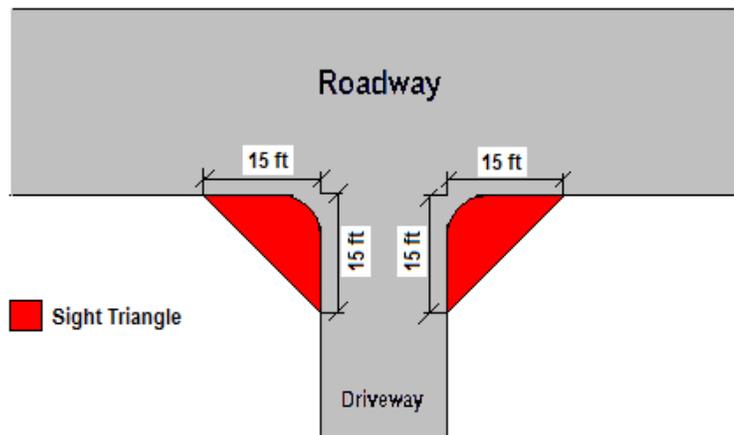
G.8.b: Sight Triangle at Driveway Intersections
